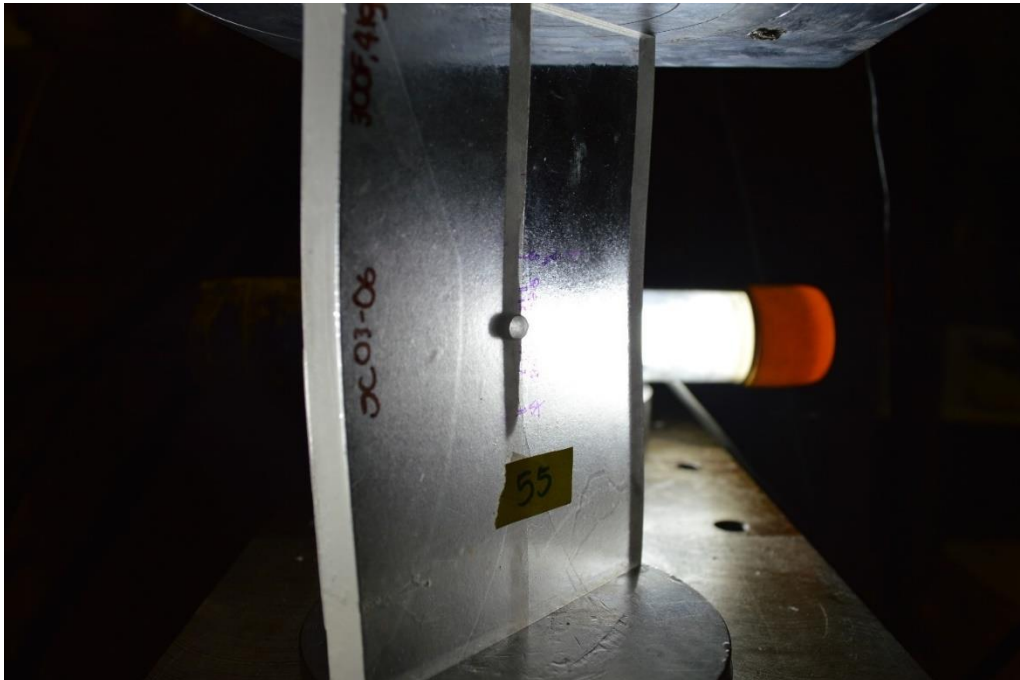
Photo taken at 54.9kN and 3.69mm compressive displacement respectively. The upper arm fracture propagated to 37mm and the lower arm fracture propagated to 23mm. The upper arm has run out of the illuminated section. The lower arm shows tunneling with the more extensive side of the fracture being on the rear face of the specimen. This is the ultimate loading point as it is the maximum load the specimen was subjected to.
